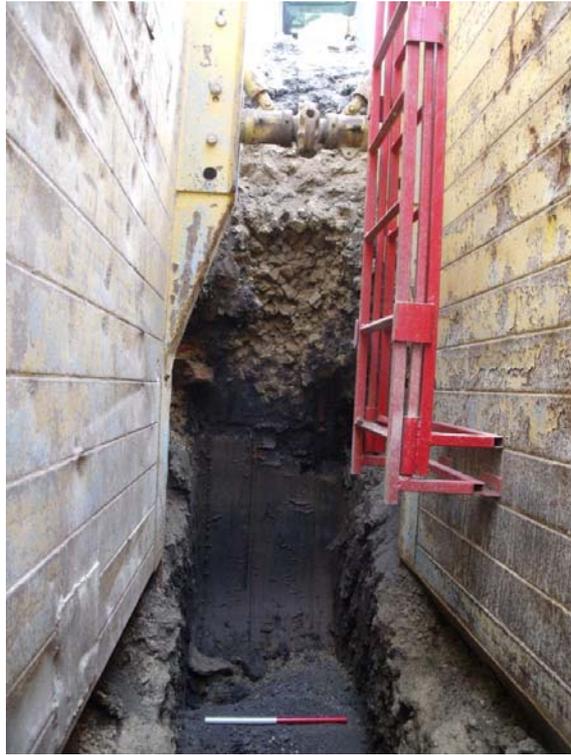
Trench 1, sample north facing section (*scale 0.5m*)
